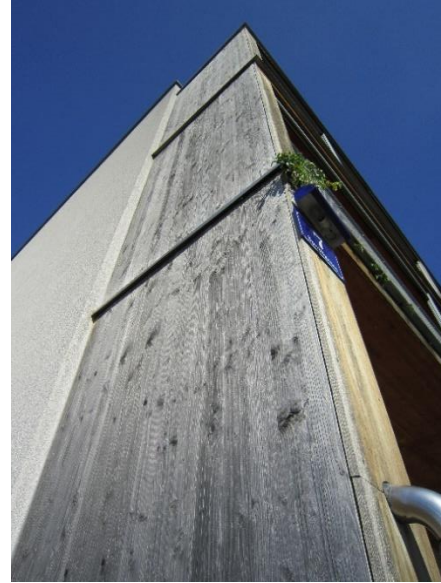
Exposed CLT on the flanking walls of the balcony in 2016. Photo by Author.
